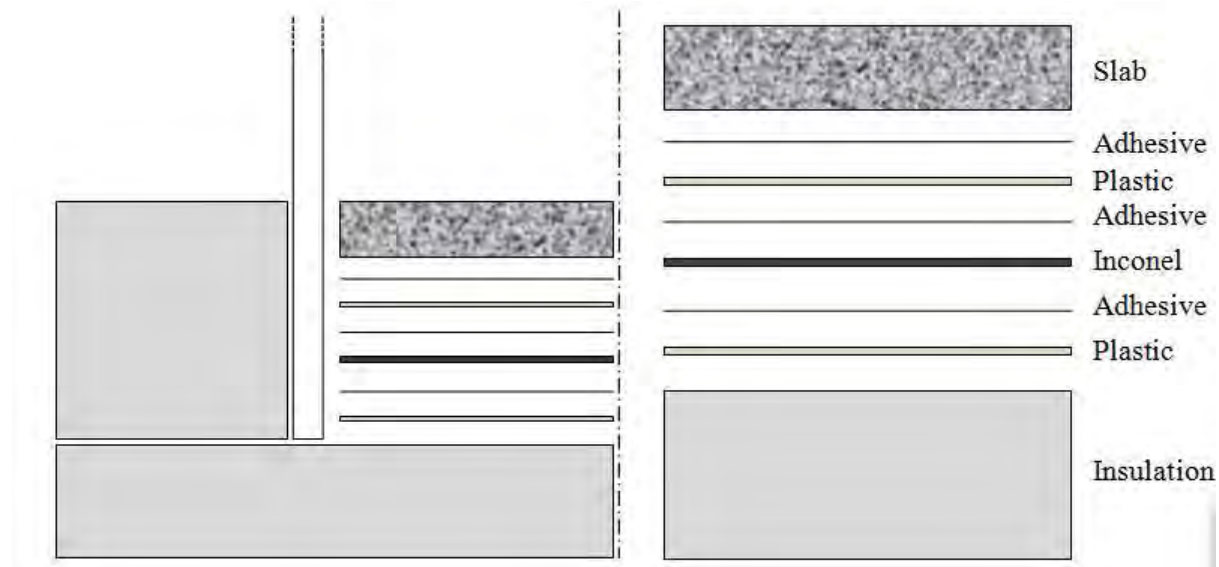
Cross-Sectional Schematic of the Test Section and the Slab Assembly
